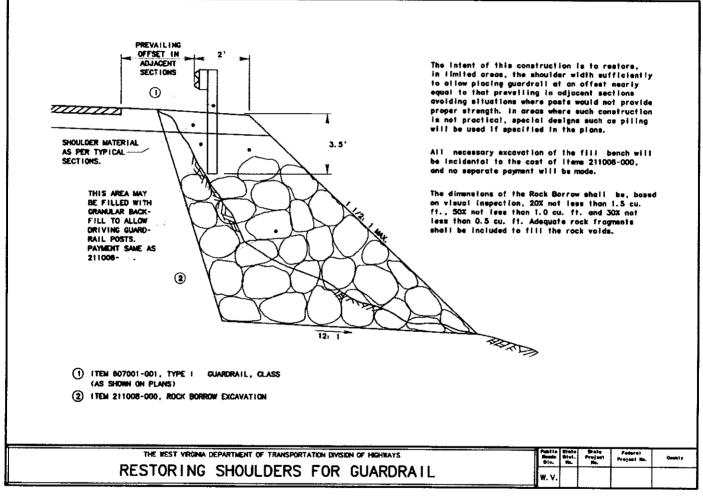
Restoring Shoulder for Guardrail Detail
